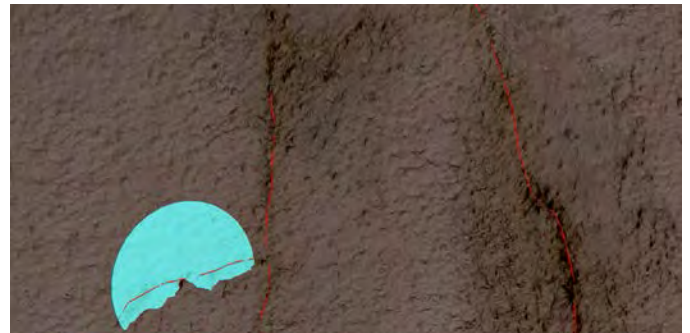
Detail of digitized shotcrete cracks on left wall by southern portal; also visible is a plane interpolated through crack trace.
